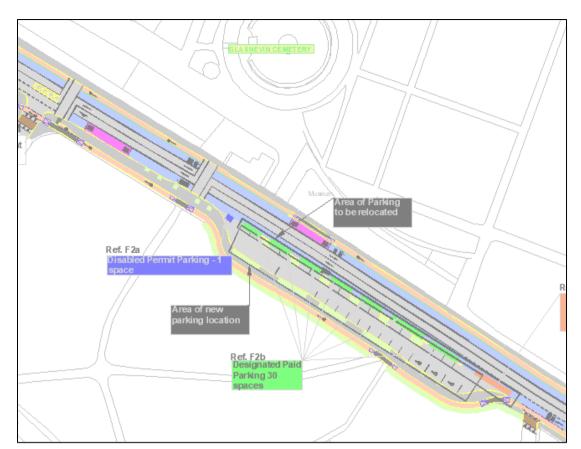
Proposed scheme design and parking changes along Church Finglas Road (across Glasnevin Cemetery)
